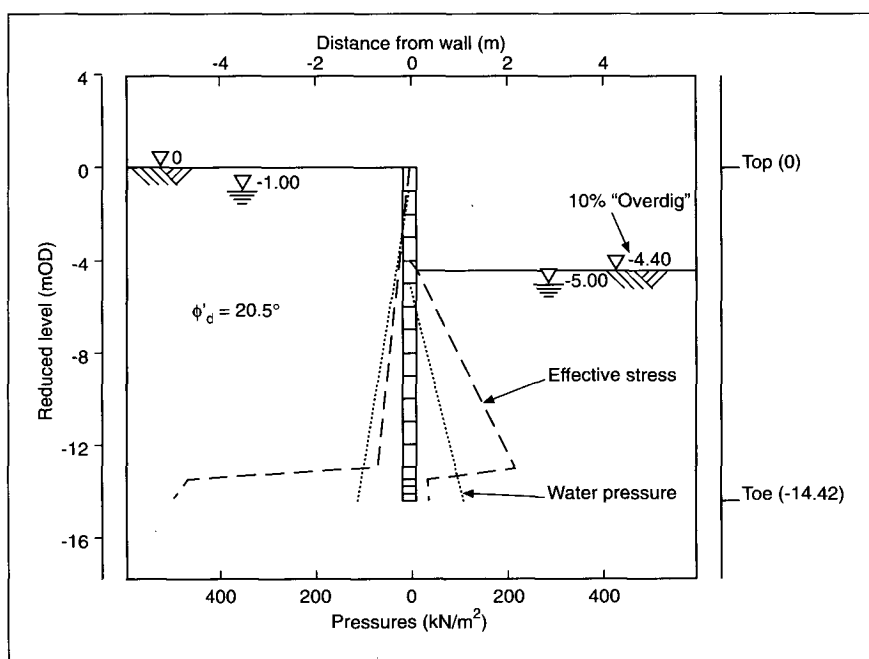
Cantilever sheet pile wall: Case C conditions and earth pressures
